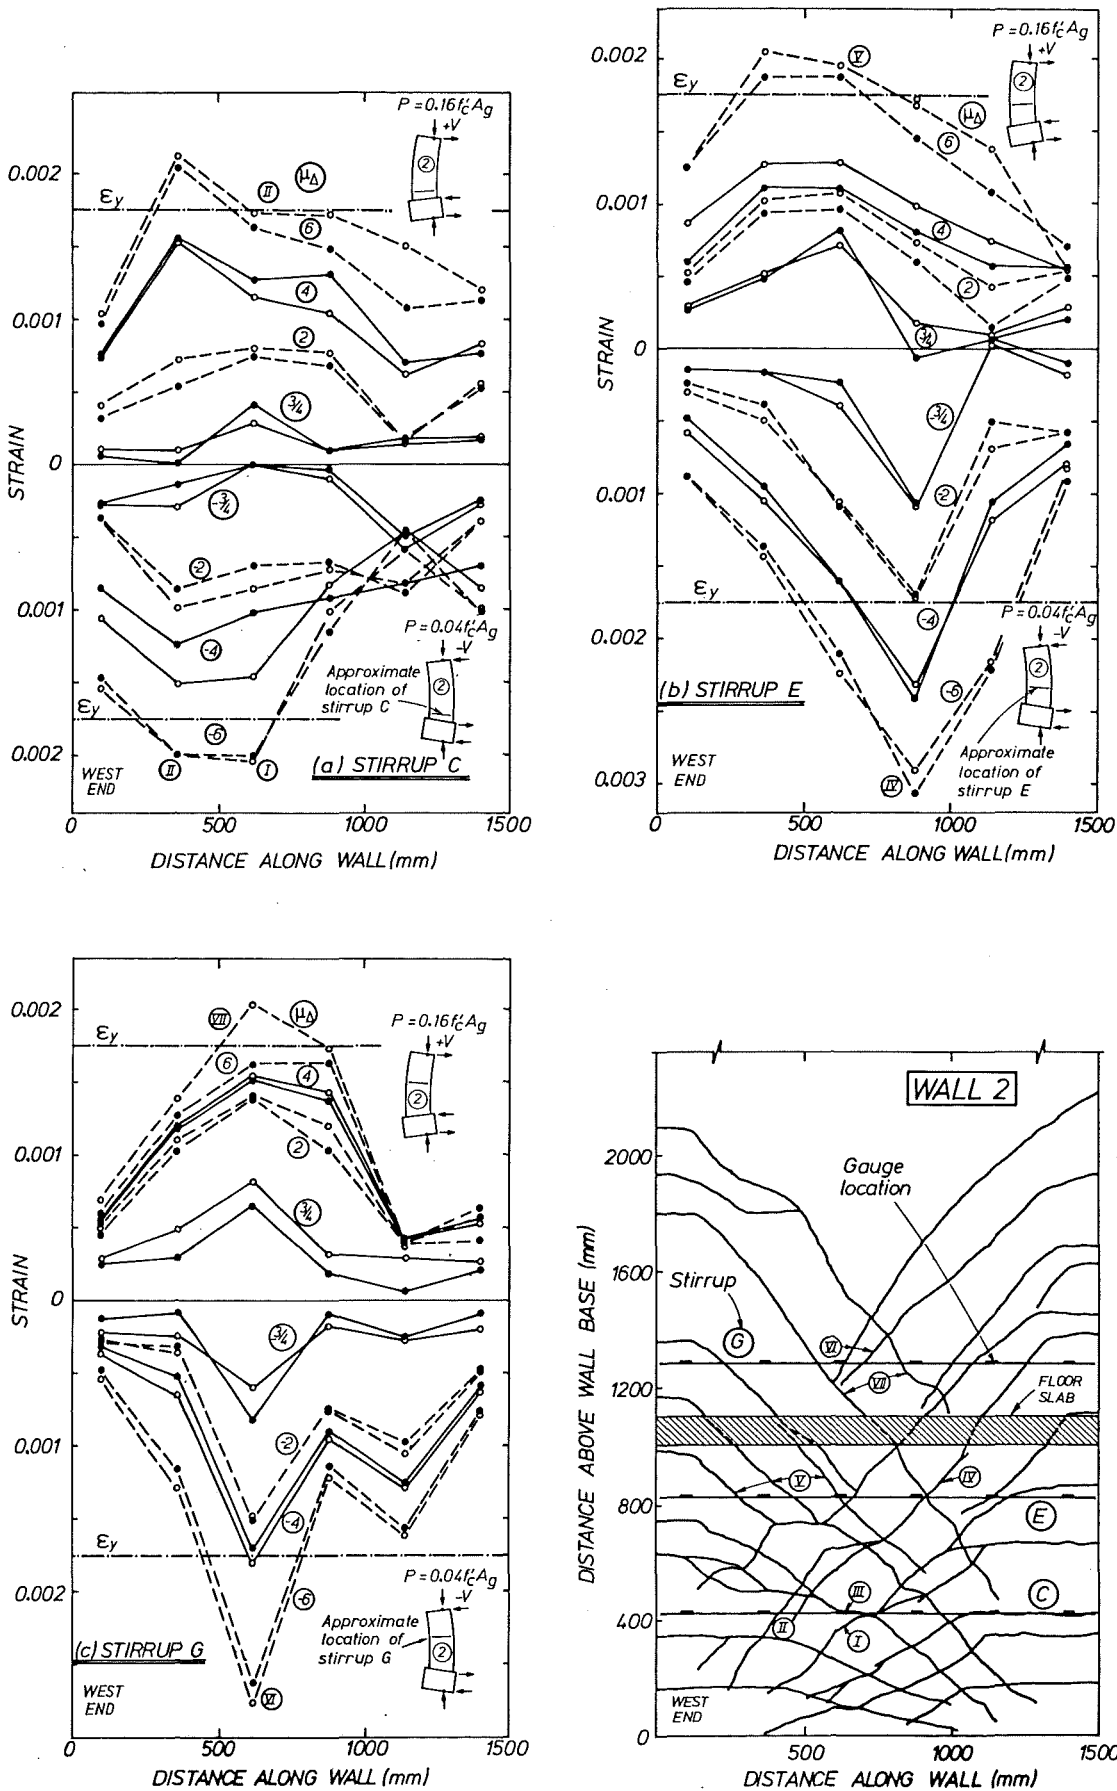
Strain Distribution in Stirrups C, E and G - Wall 2.
